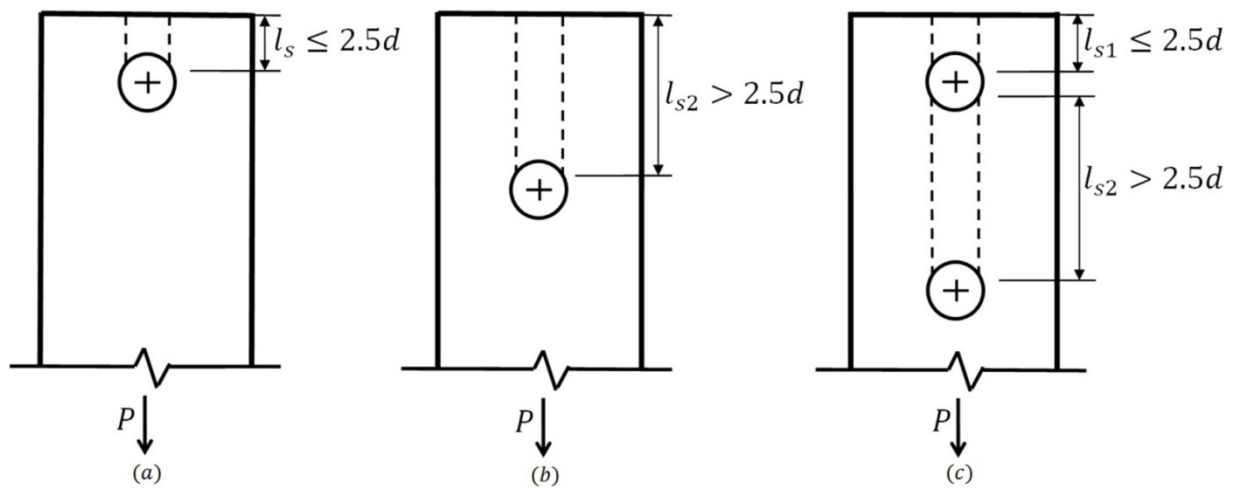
Threshold shear lengths: (a) Shear-out; (b) Bearing;; (c) Shear-out and bearing
